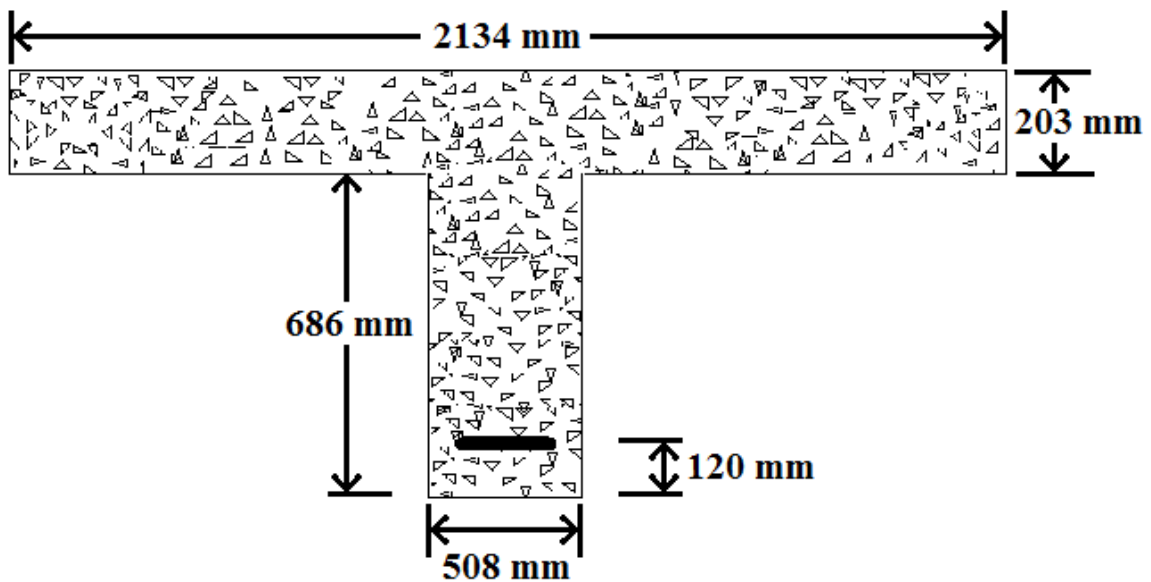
Cross Section of interior girder (mid-span) Trimble, Cousins and Seda-Sanabria (2003), 12 m concrete T-beam (x4), bridge
